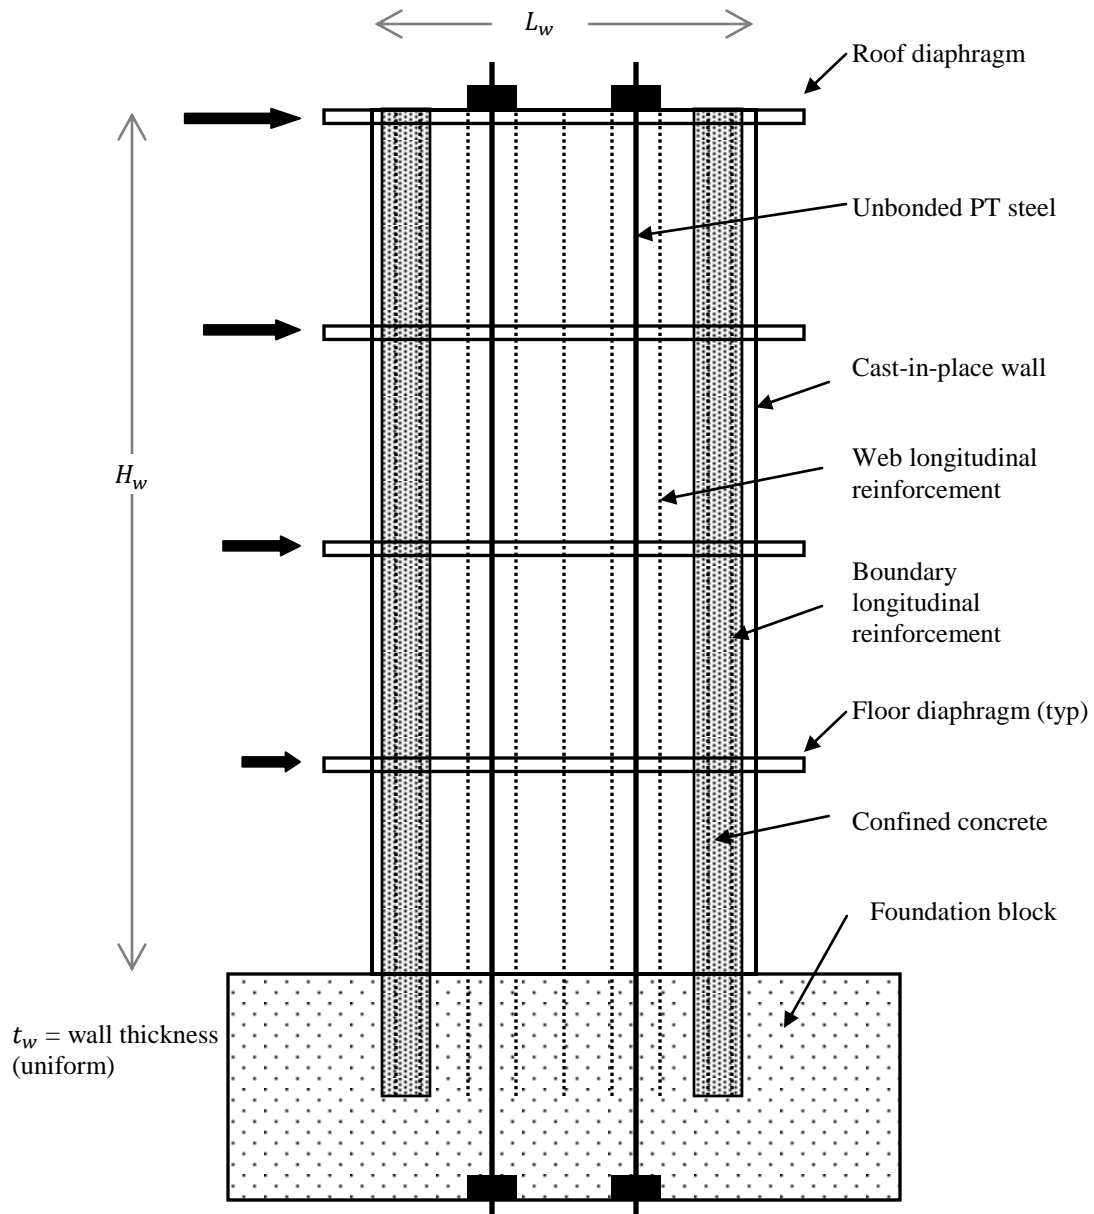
shows the vertical forces acting on a wall. As shown in Figure 2.1 length of the wall along the base is denoted as  $l_w$ , the vertical elevation is denoted as  $H_w$ , and the thickness is denoted as  $t_w$ . Lateral forces are assumed to act at the floor and roof diaphragm levels.
